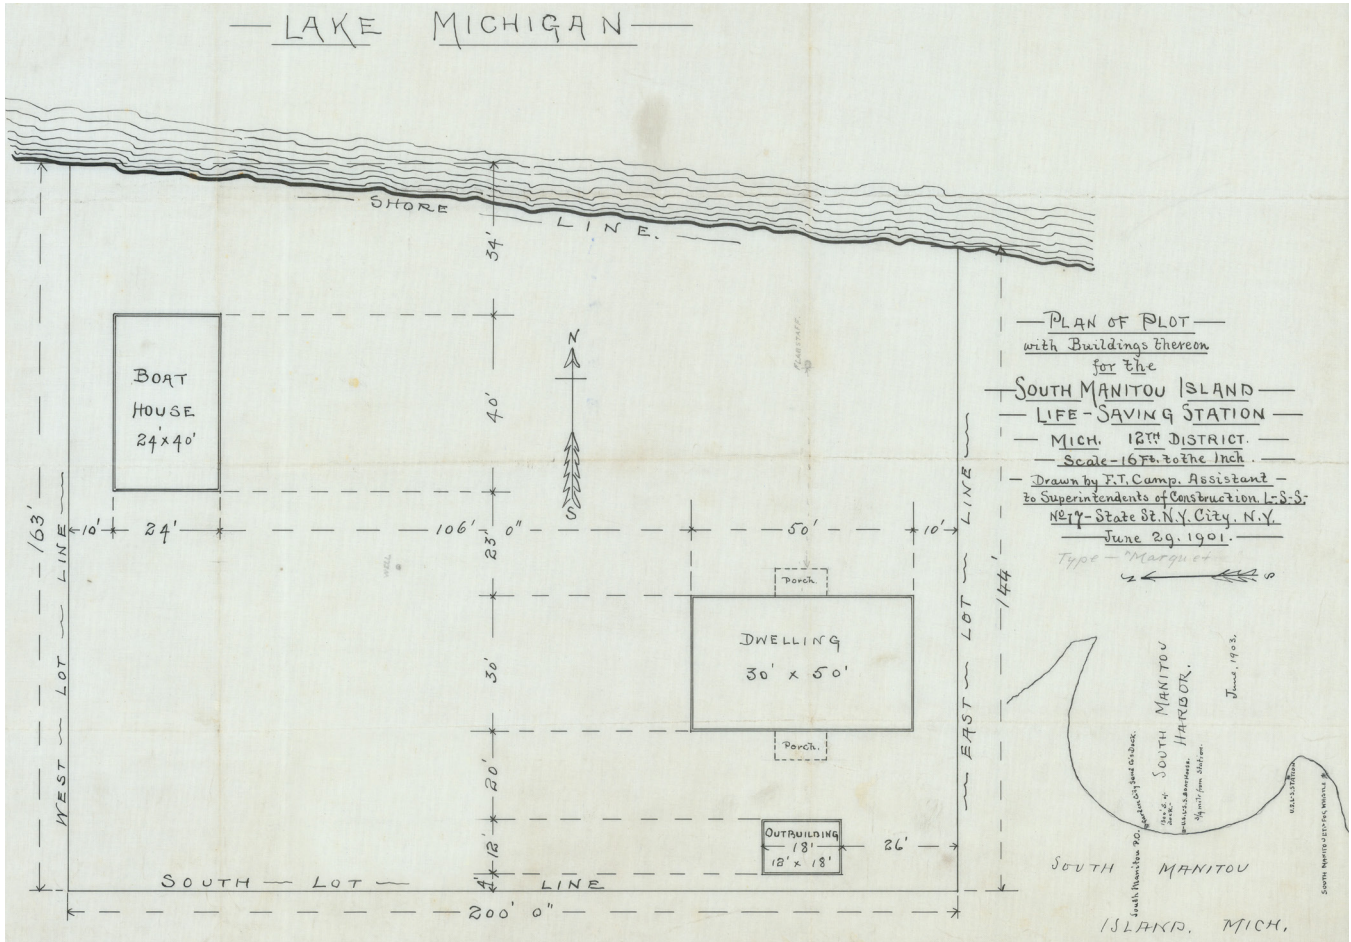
1901 South Manitou Island Life-Saving Station plan of plot with locations (source: National Archives).
